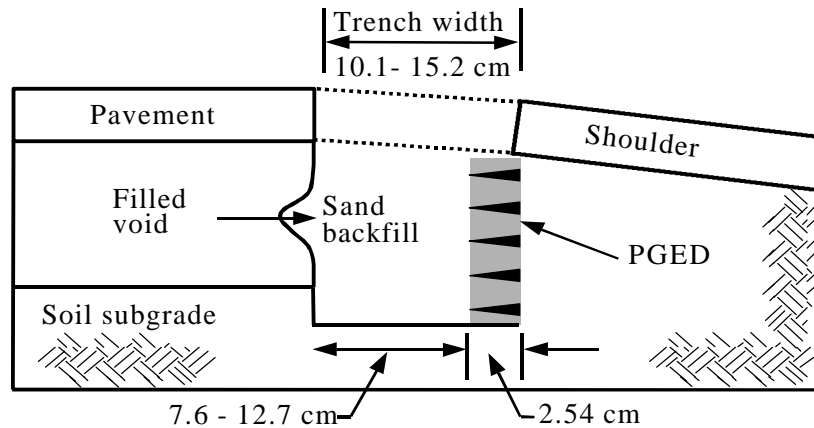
Recommended method of placing retrofitted geocomposite edge drains.⁽¹⁷⁾
